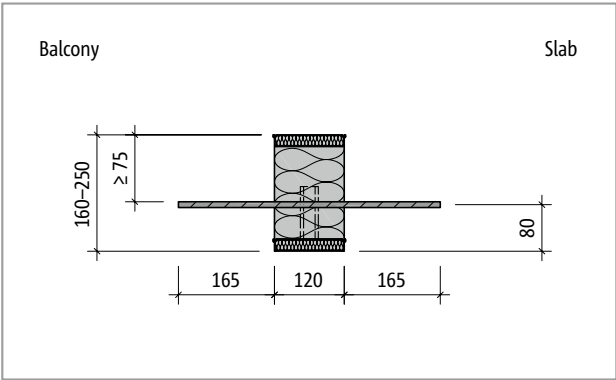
Schöck Isokorb® XT type H-NN1: Product section
